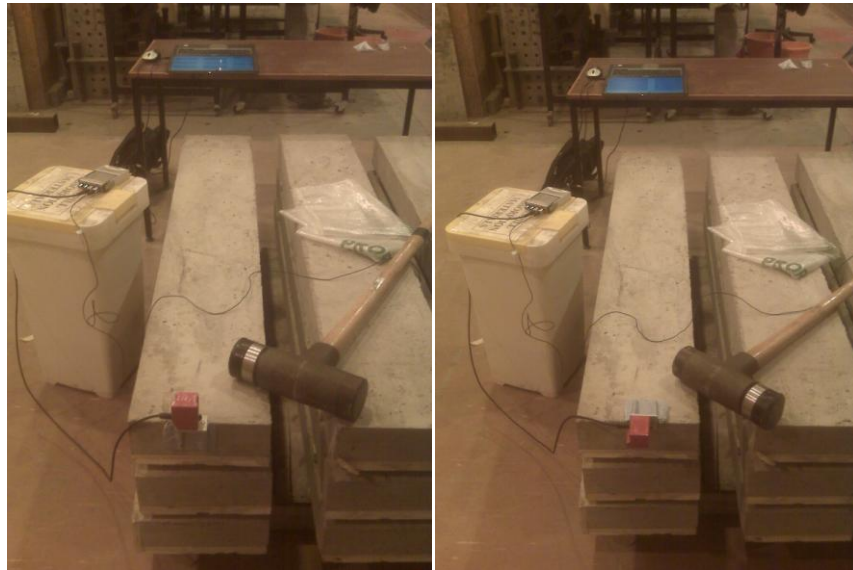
Testing vertical and horizontal geophone orientation on beam
